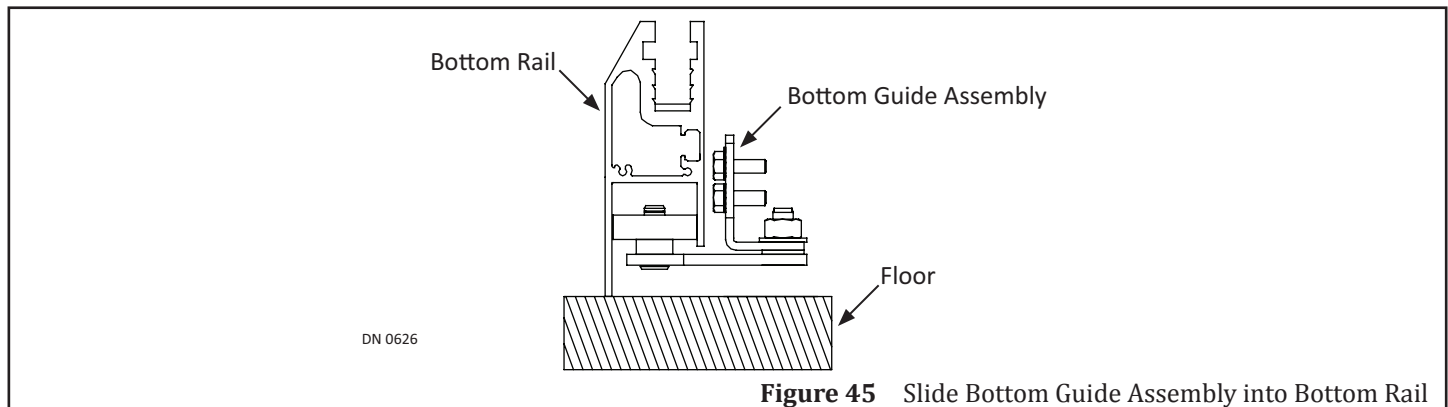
Slide Bottom Guide Assembly into Bottom Rail
